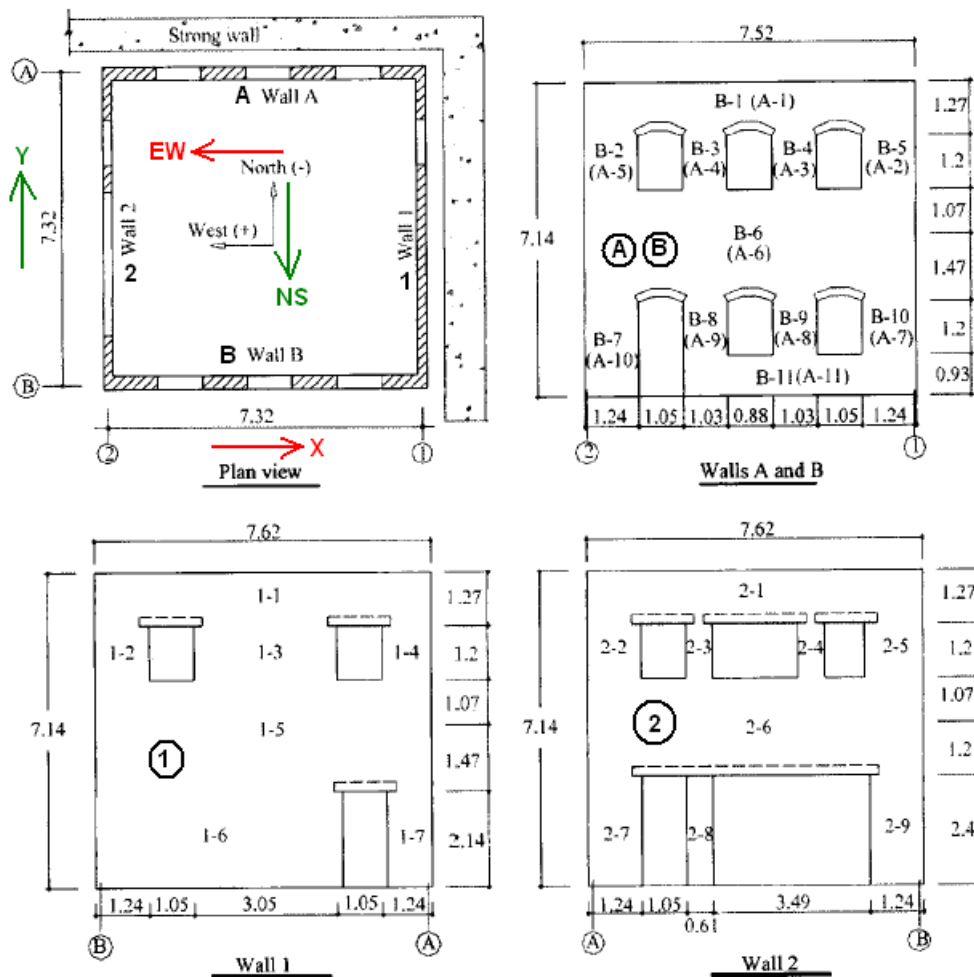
Plan view and elevation of test structure (dimensions in meter)
